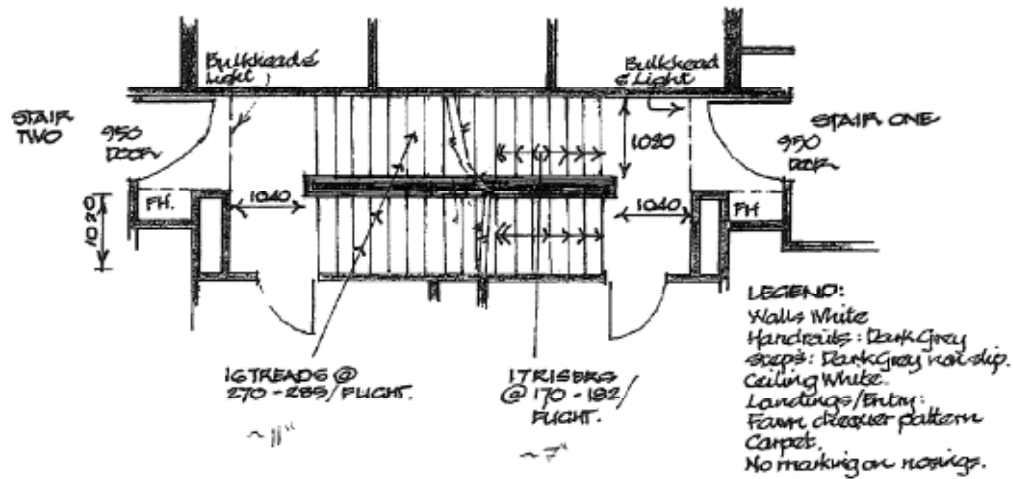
Christchurch Stair Plan (MacLennan, 2011)
